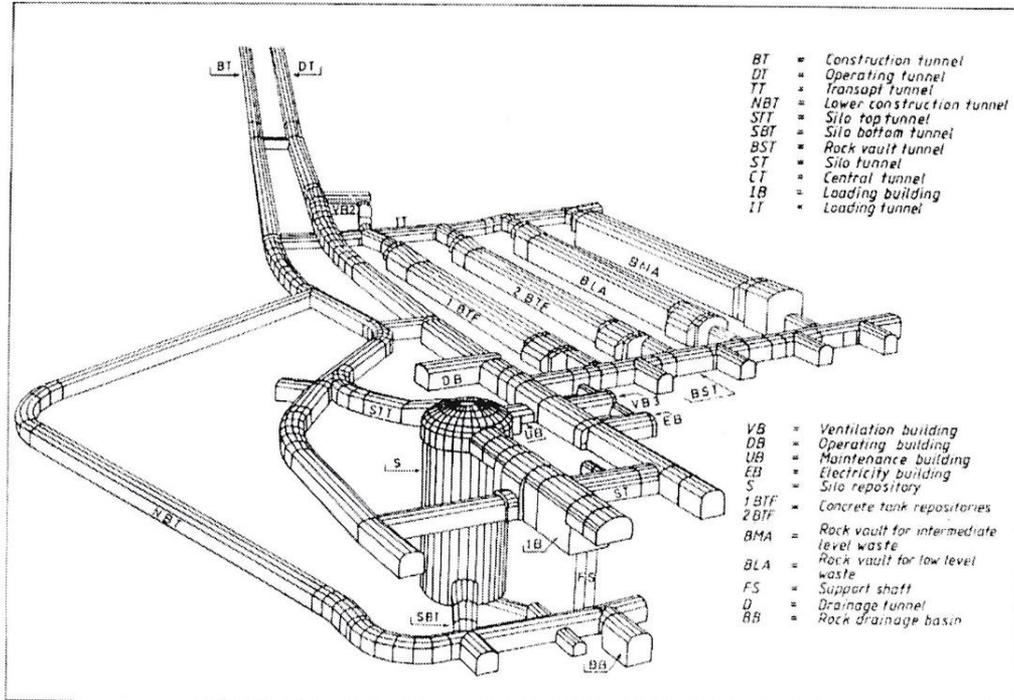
Overview of SKB's facility for disposal of LLW in tunnels and of LLW and ILW in a concrete silo built in a big cavern (After SKB).
